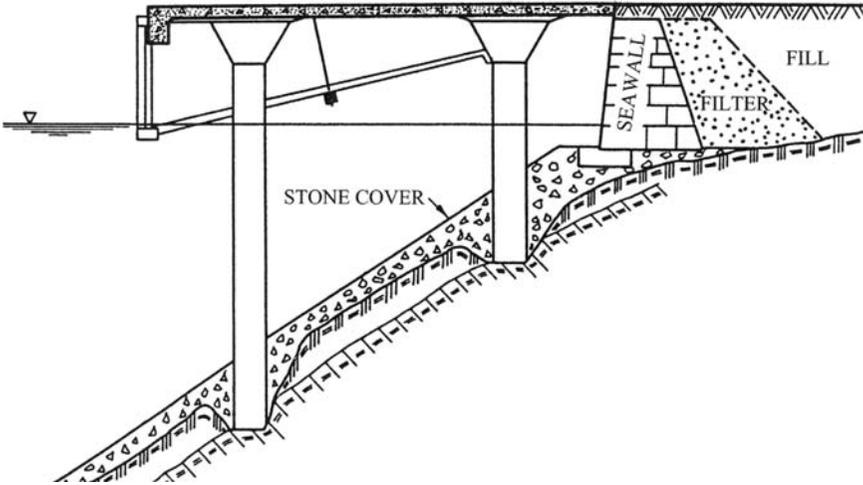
A section through an open concrete harbour structure with a reinforced concrete deck on top of slender, reinforced concrete pillars cast under water (source: Gjørnv (1968)).
